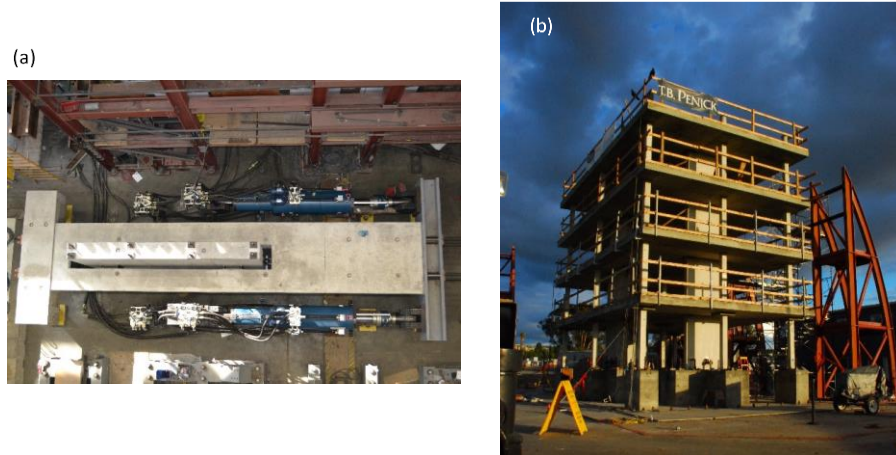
Photos of test specimens: (a) full-scale sub-structure; (b) half-scale shake table test specimen.
